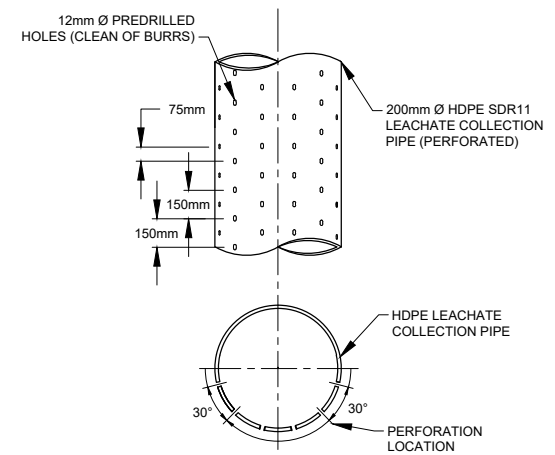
LEACHATE COLLECTION SYSTEM TOE DRAIN / LEACHATE COLLECTION SYSTEM PIPE CONNECTION
